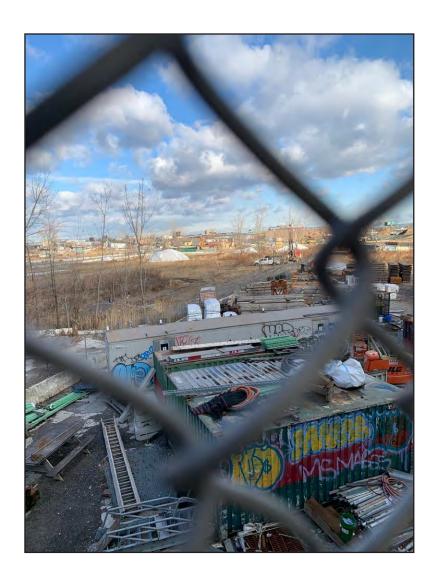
Overview of the Tully Site from Roosevelt Avenue.
